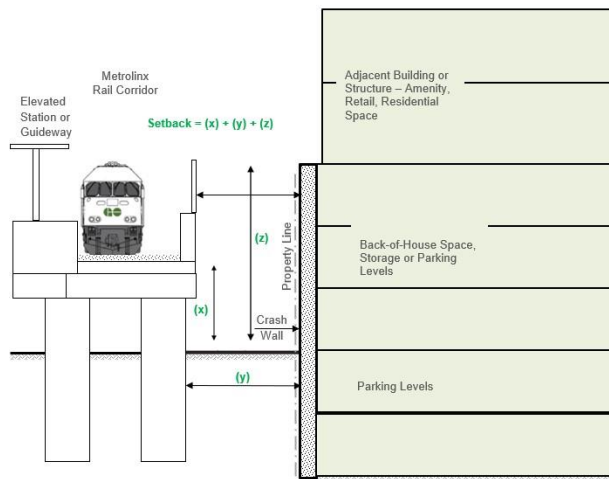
Setback Adjacent to Elevated Rail Corridor
